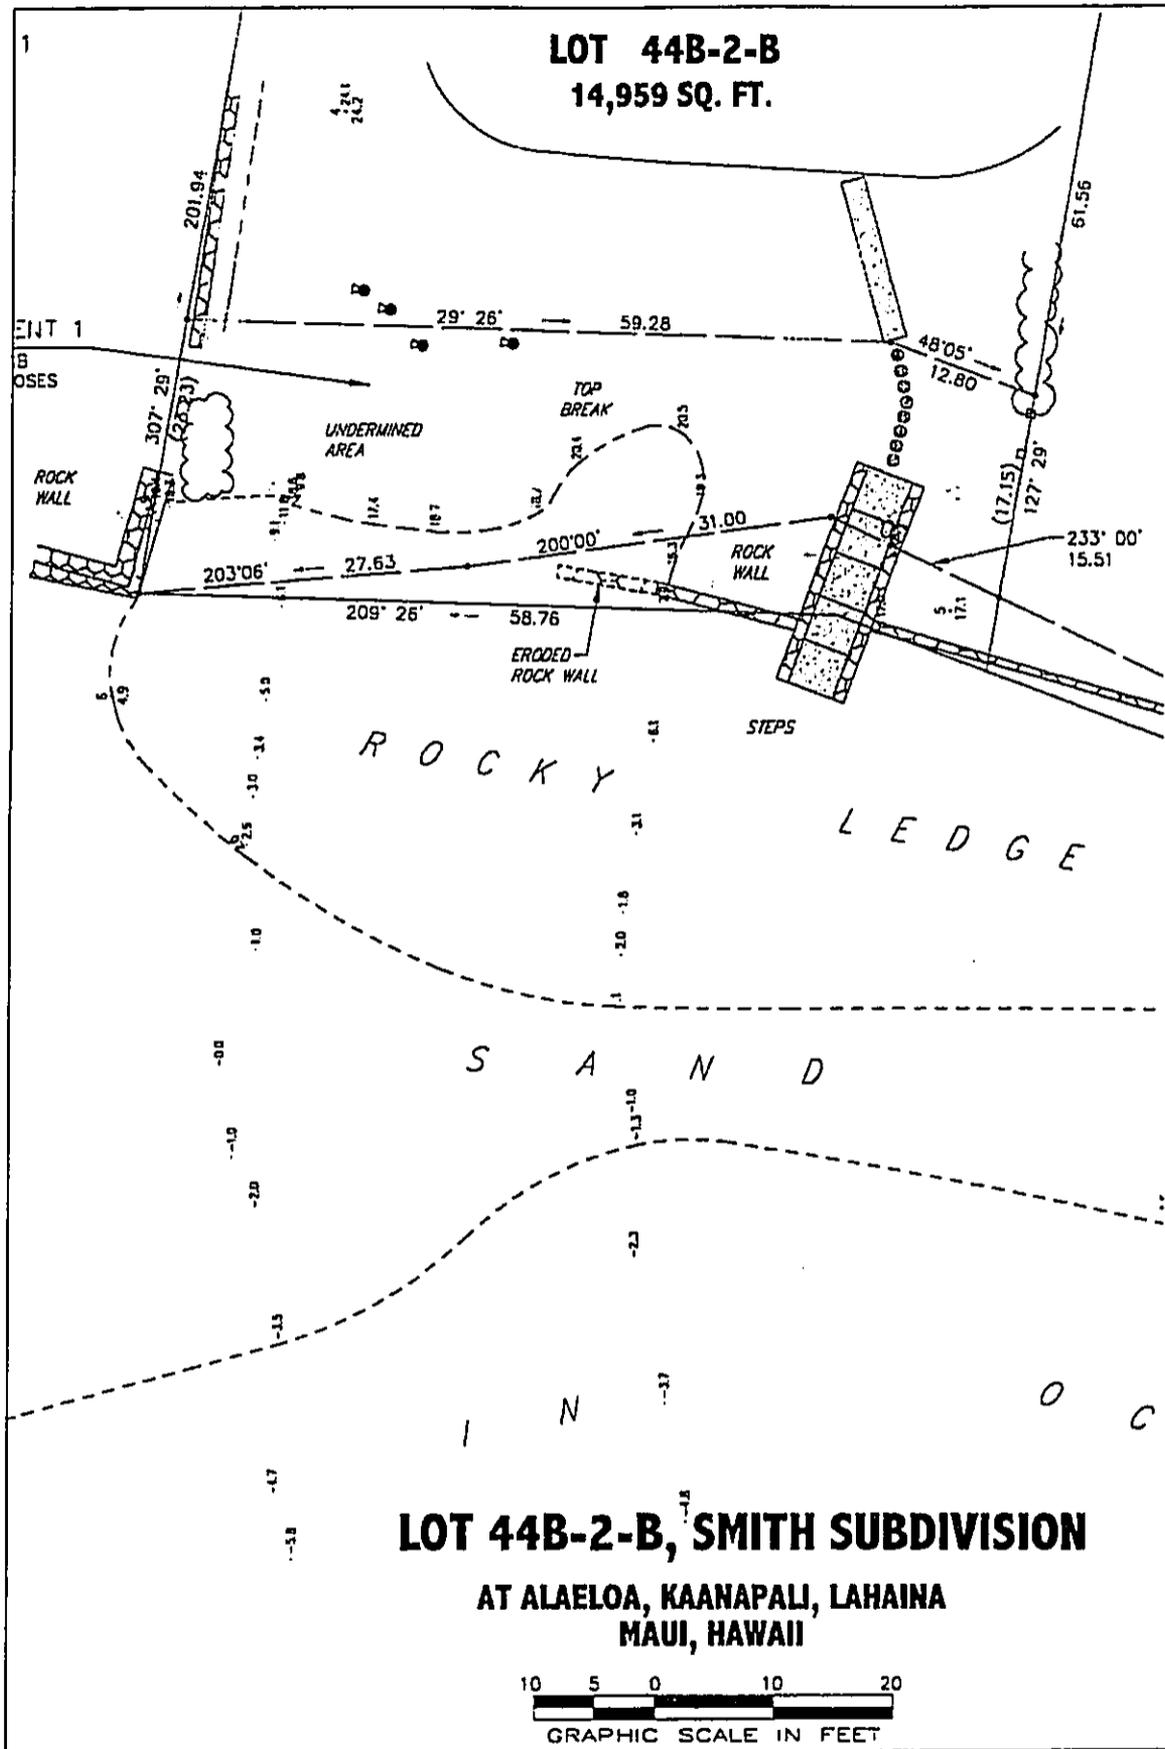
Site Plan (by Tanaka Engineers, Inc.).
